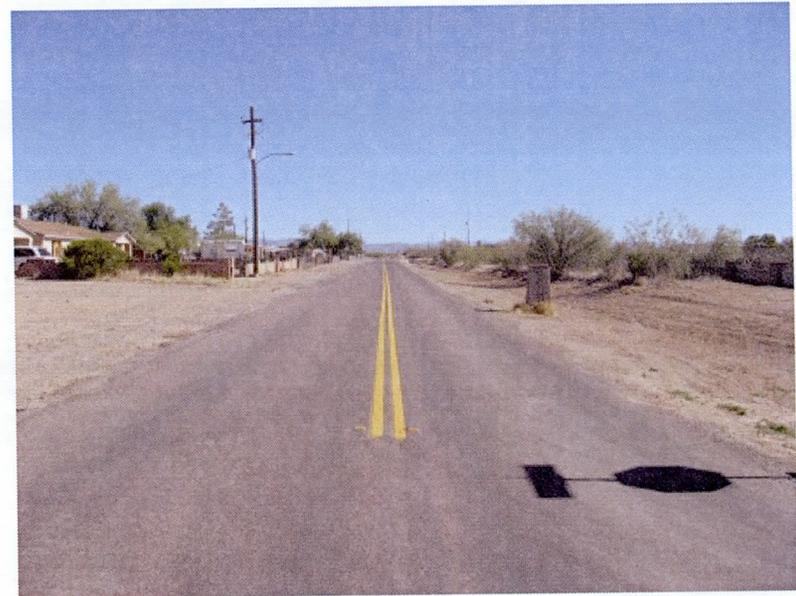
At the intersection of Citrus Road and Balfour Blvd. looking north at Citrus Road.
